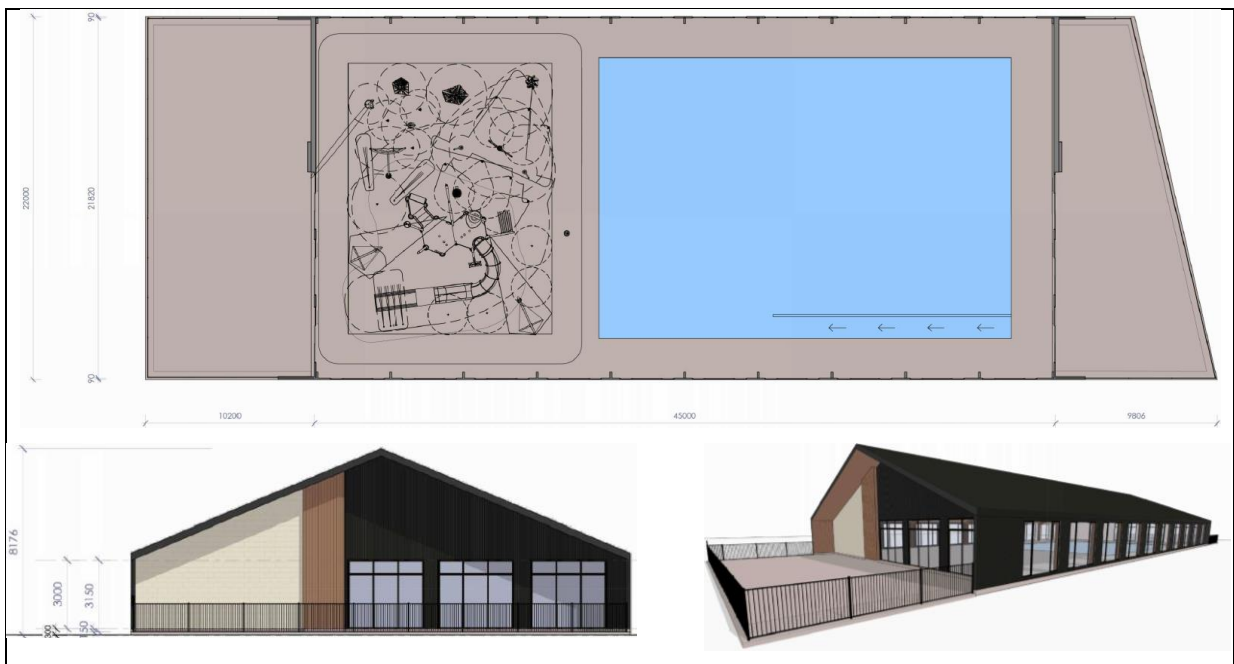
Indoor Pool Building - Floor Plan & Elevations - Sheets 10 & 11. Source: Green Hill Design
